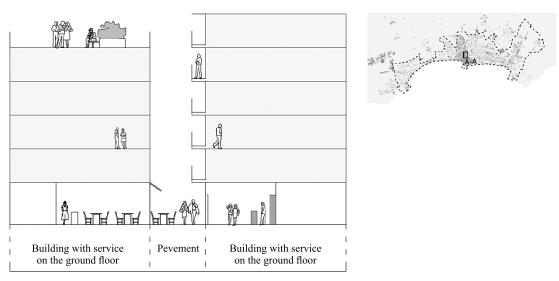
Section A-A. Sections of selected street in Benidorm, 3-6 storey buildings *Source*: own study.
